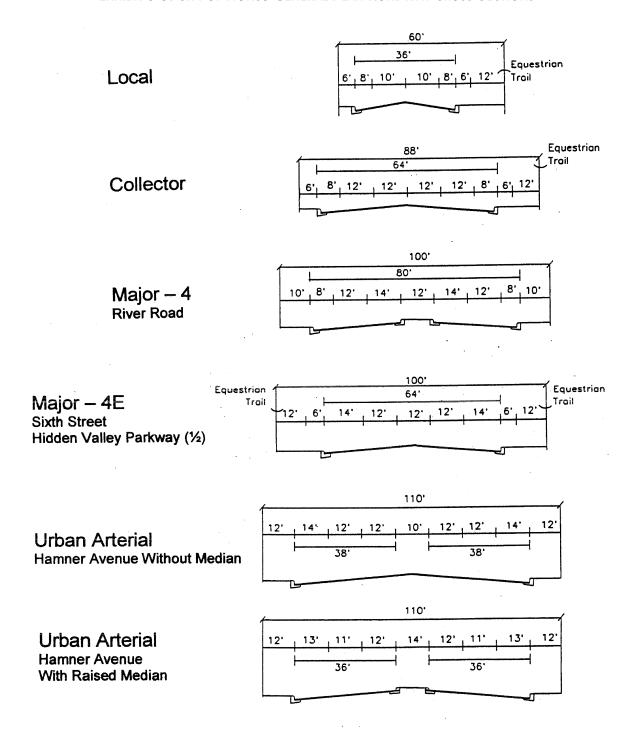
CITY OF NORCO GENERAL PLAN CIRCULATION ELEMENT
